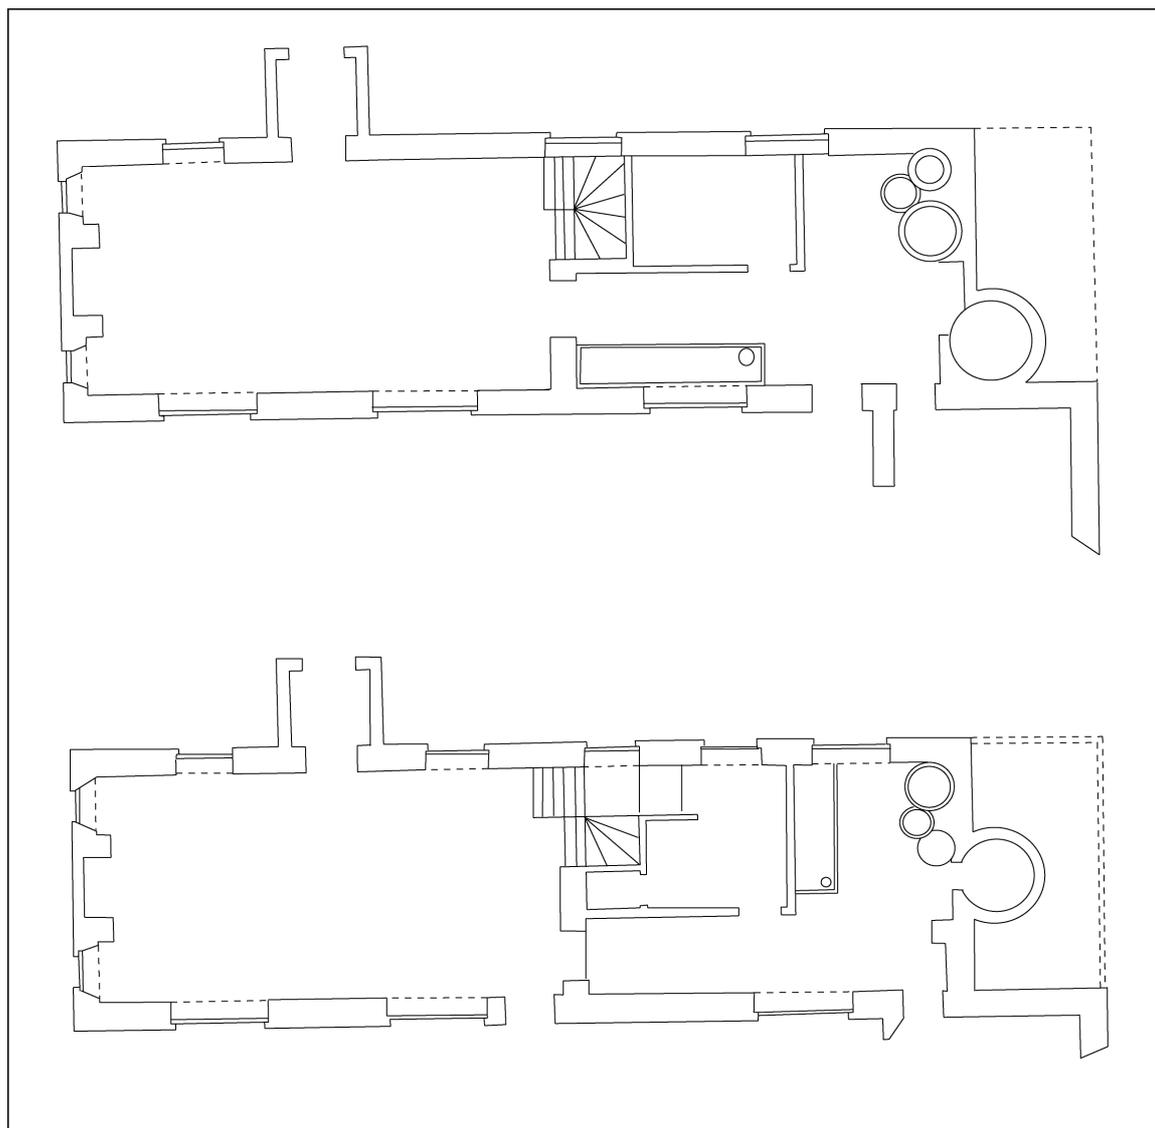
Ground floor plan of the Jenner School, based on an original plan of c.1840
